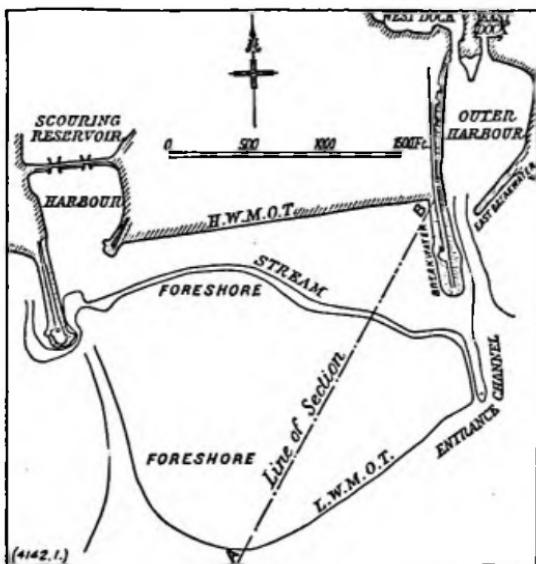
Plan of Burry Port Harbour, South Wales.
